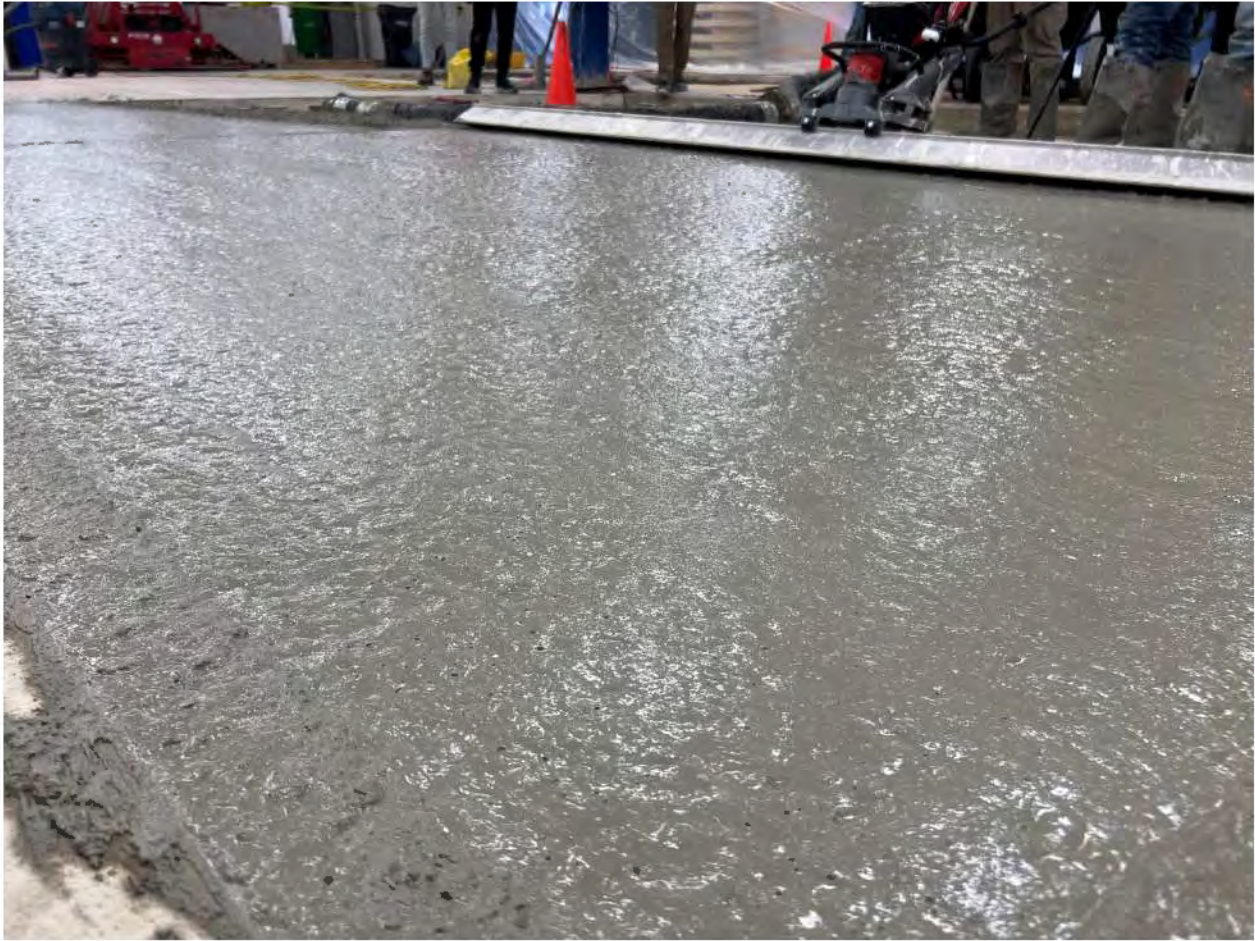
Slab 2 Mix 2 close-up photograph of concrete surface following vibratory screeding.
